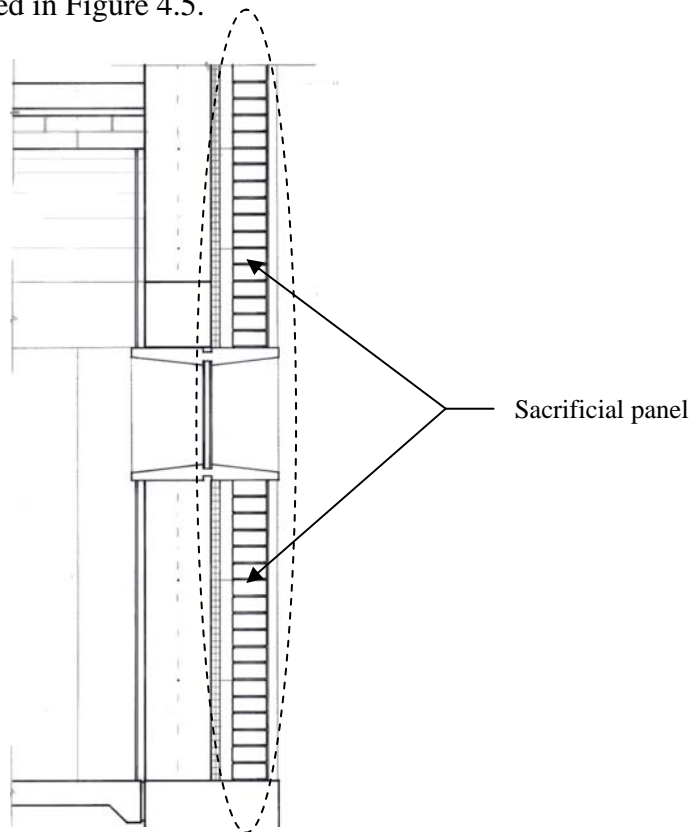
Sacrificial Panel. The exterior curtain wall of adobe bricks serves as a protective layer to reduce the spalling potential of the interior wall.
